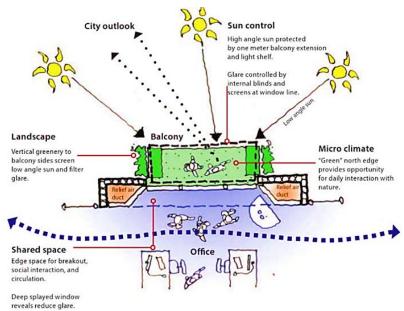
Conceptual plan diagram describing green façade function (Author, 2016)
